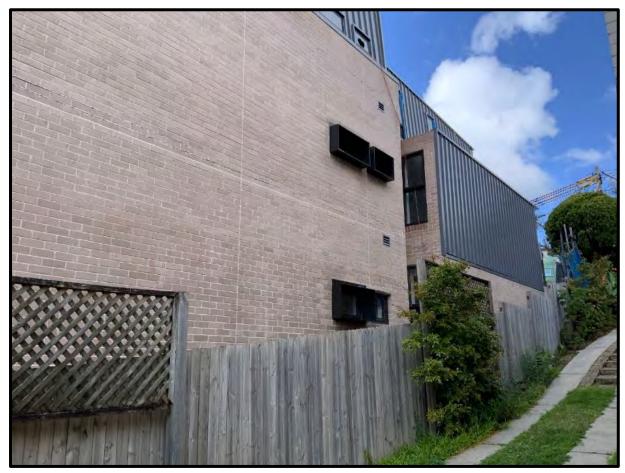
Photo of the southwestern elevation of the residential flat building under construction at 18 Illiliwa Street, noting the lack of openings, which avoids any visual bulk impacts associated with the height variation.
